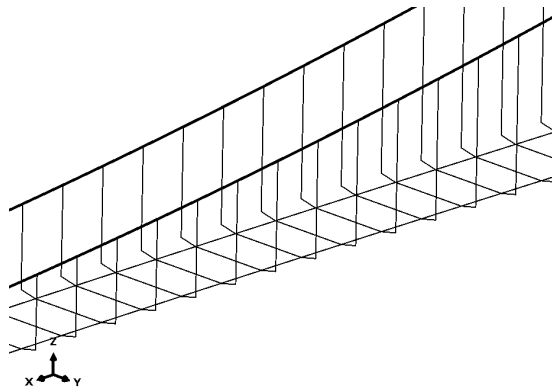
Close up illustration of the girders with connection elements, hangers and cables.
